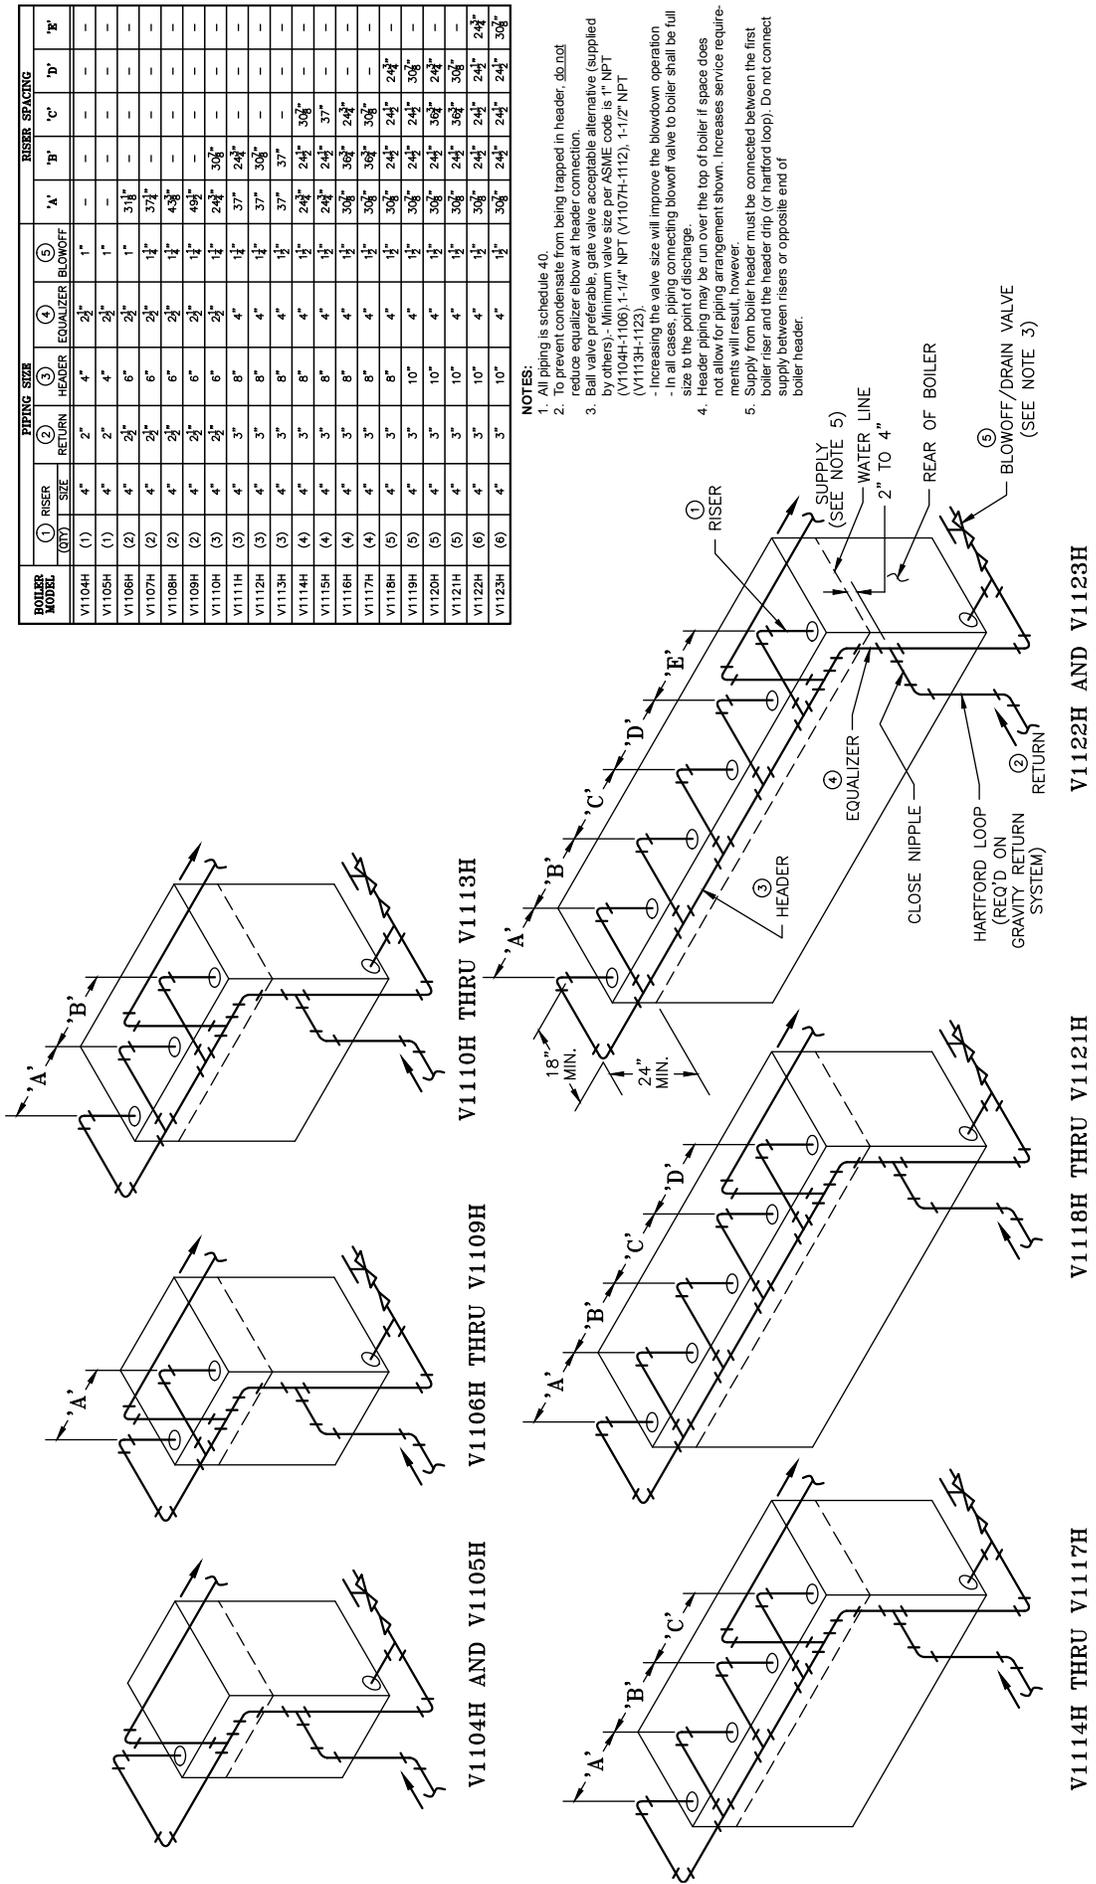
Minimum Piping Requirements V11H Series Steam Boilers - Gravity Return
